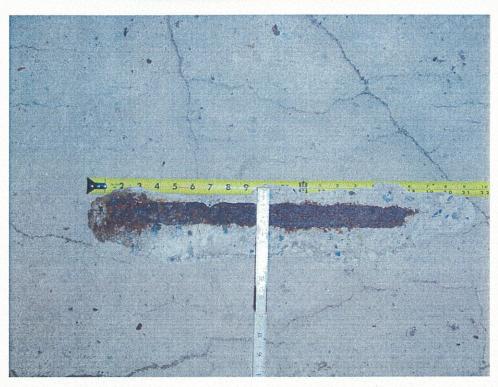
5^{th}$  Floor Column Concrete sample removed by sledge hammer is 22" x 4".
